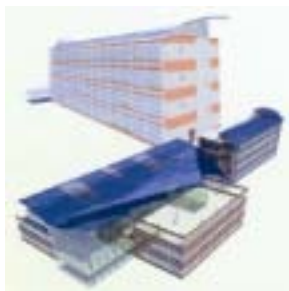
Architectural value for new and refurbished buildings - Maquette of the ECN office and laboratory buildings in an innovative design. Roof integrated PV system (26,7 kWp) and refurbished façade with photovoltaic shading elements (71,9 kWp). Source: ECN, Petten, The Netherlands.
